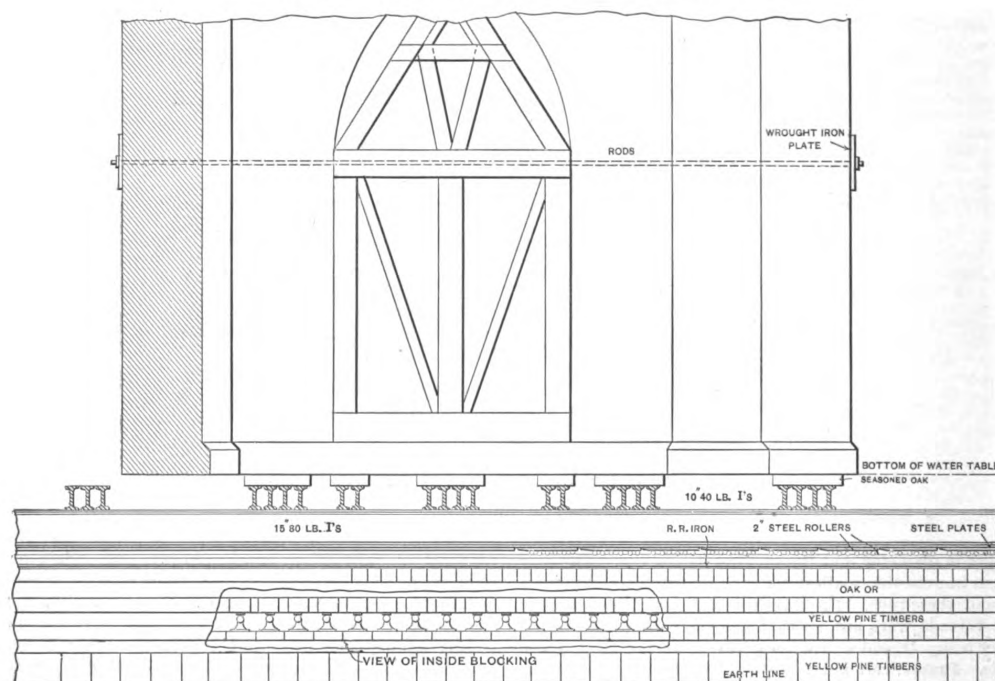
View of Tower Loading and Entrance Bracing, Looking West.
